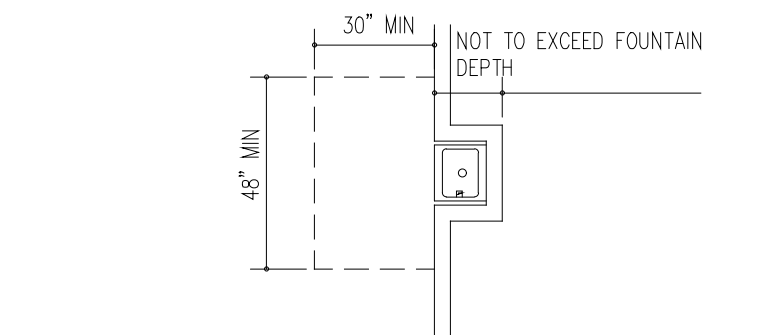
+ SECT. 305: CLEAR FLOOR SPACE
